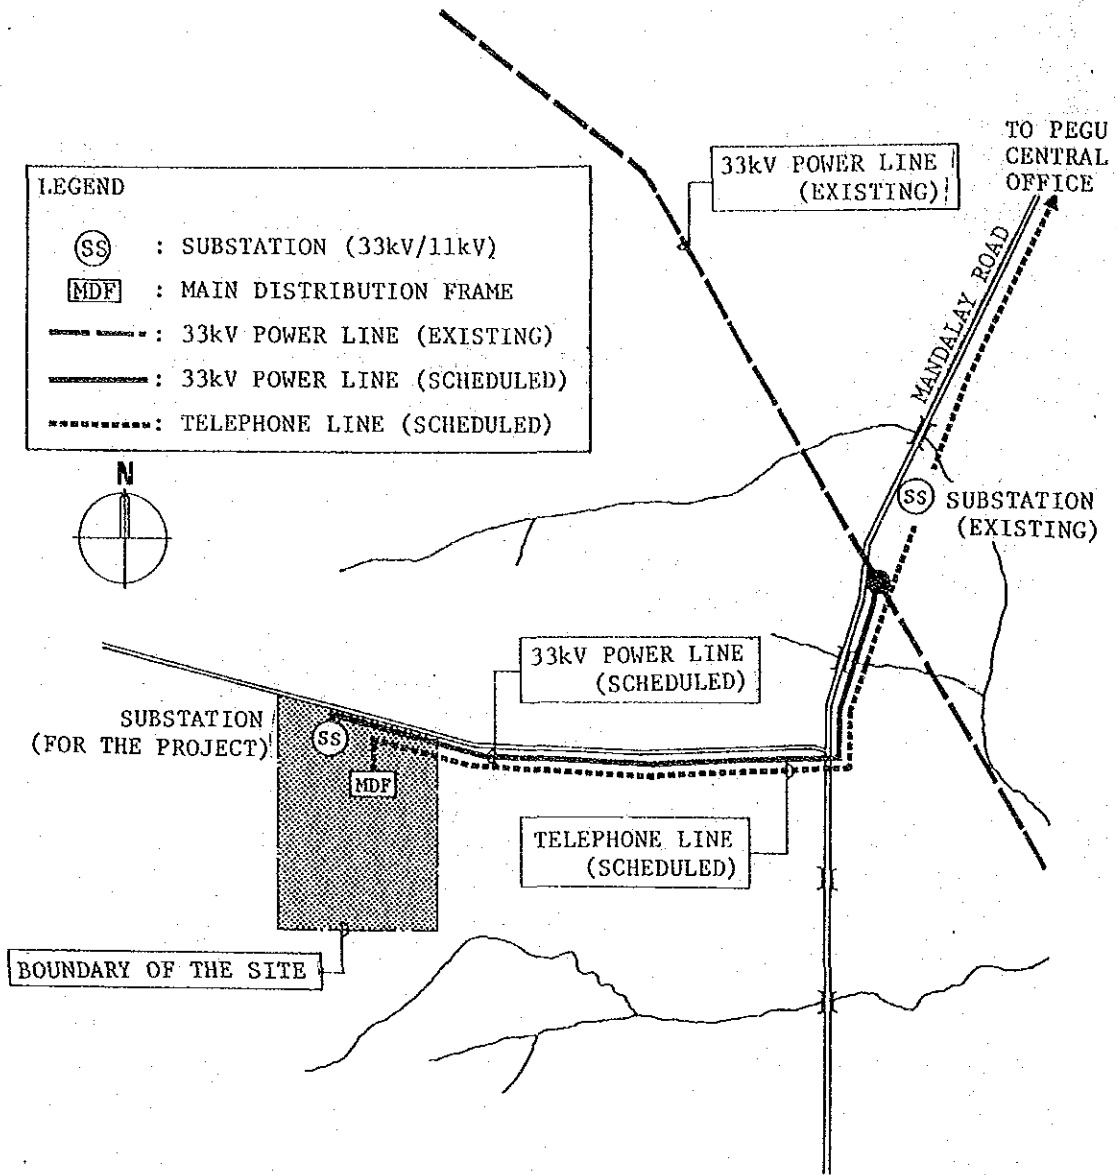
Power and Telephone Line for the Proposed Construction Site
